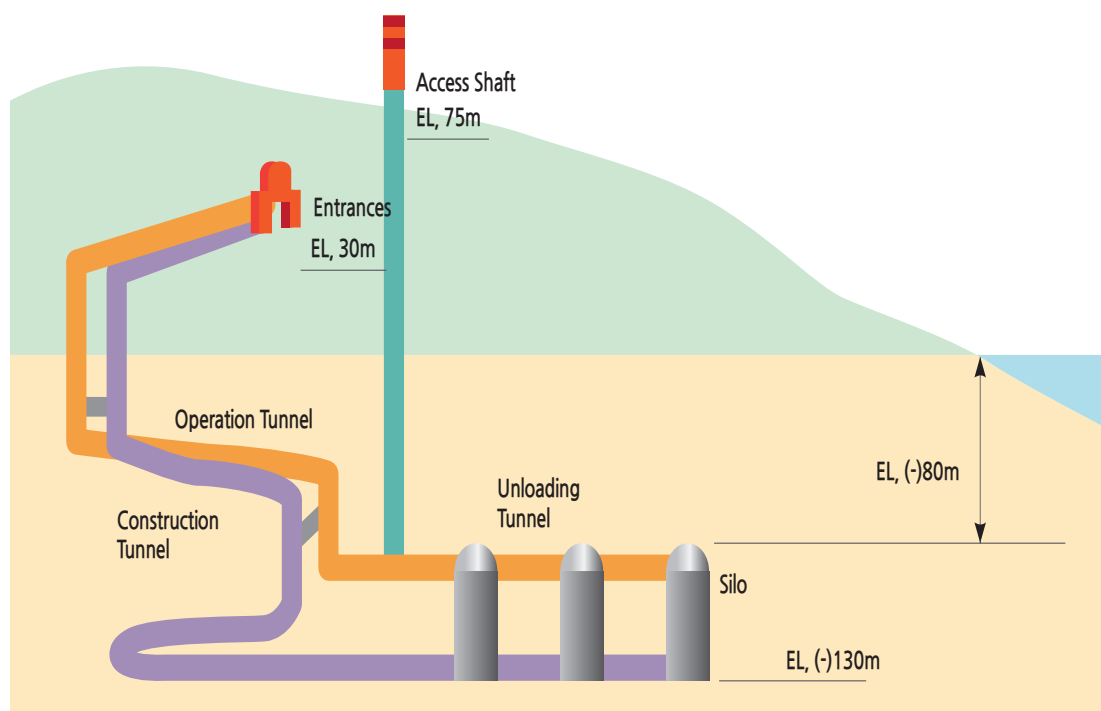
Cross Section View of Underground 1st Phase Disposal Facility
